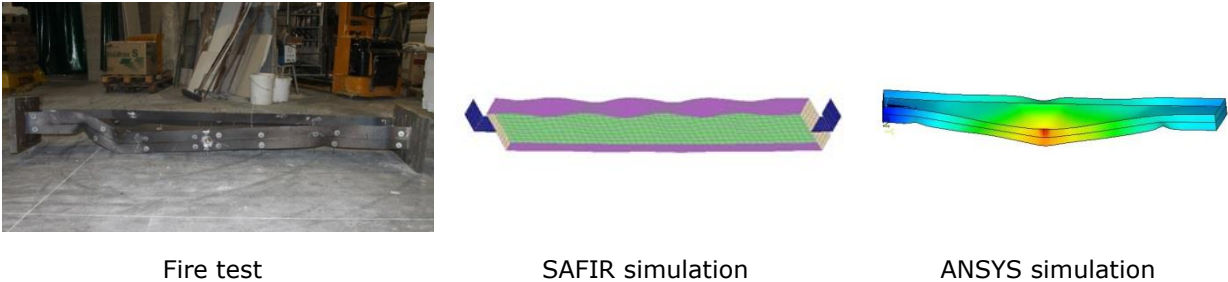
Failure mode shape of the sixth tested beam-column
